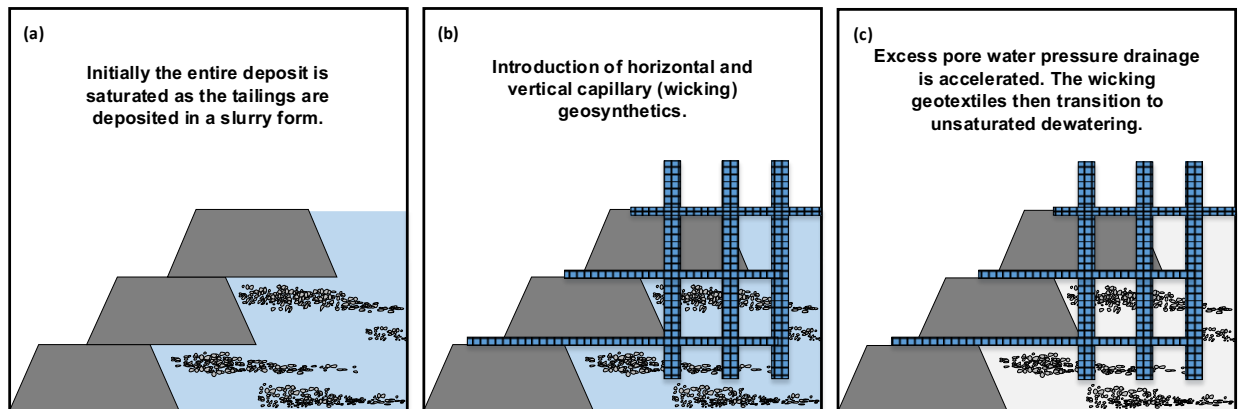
(a) Operational TSF at full saturation with the (b) installation effects of horizontal and vertical wicking geotextiles to (c) accelerate excess pore water drainage and unsaturated dewatering.
